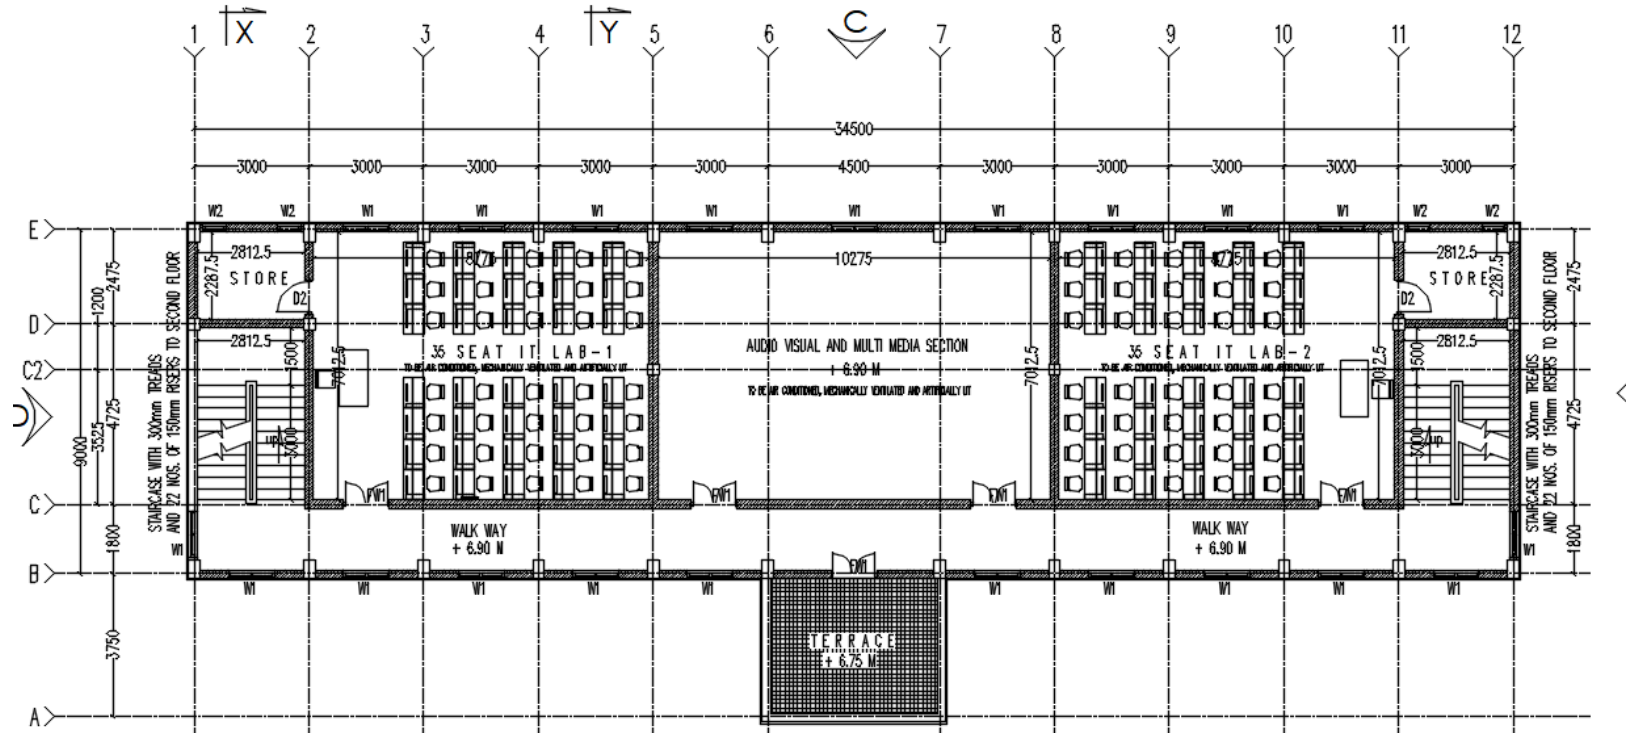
Second floor plan – Mahanama college, Colombo 03.
